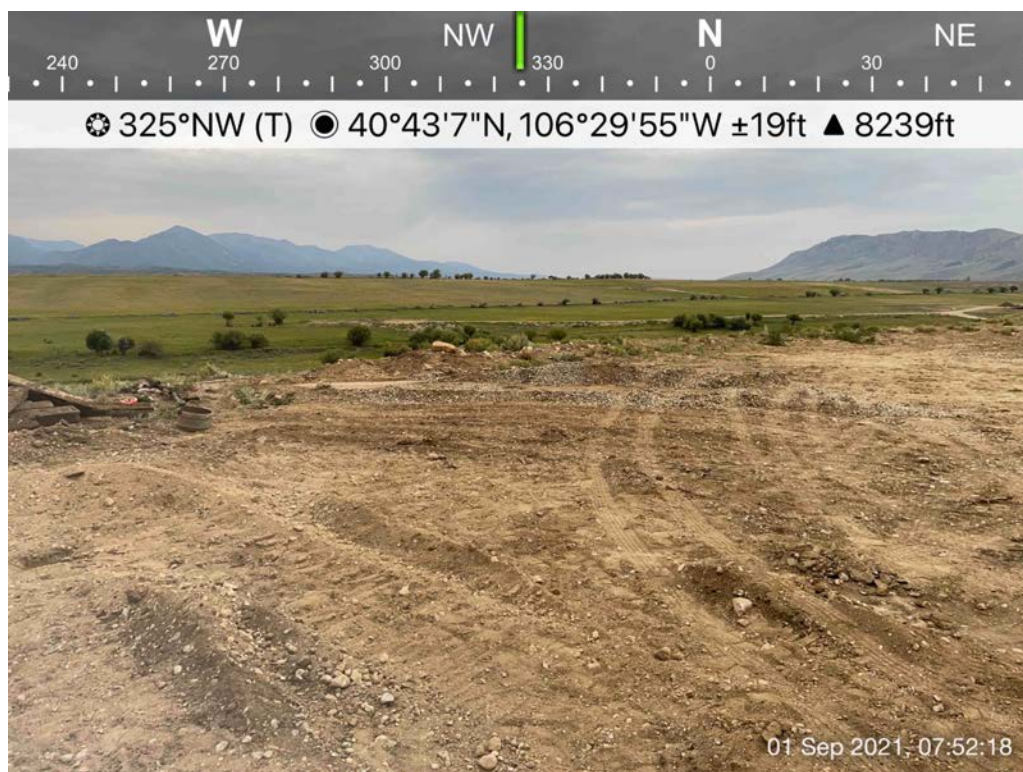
Margaret Spaulding (OWP) #4 well site location, 9/1/2021.
